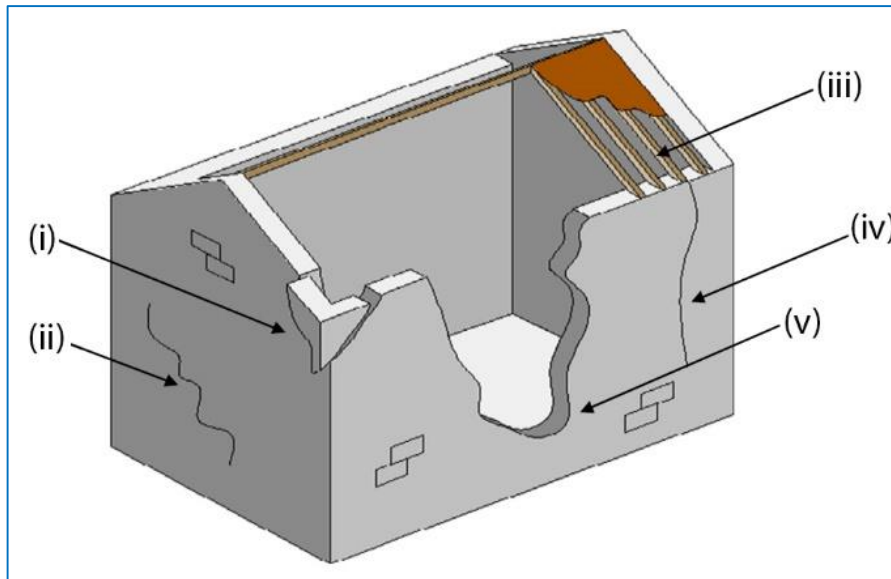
Common failure mechanisms for adobe structures: (i) separation of walls at corners; (ii) diagonal cracking in walls; (iii) separation of roofing from walls; (iv) vertical cracking in walls; (v) out-of-plane wall failure, (extracted from [121]).
